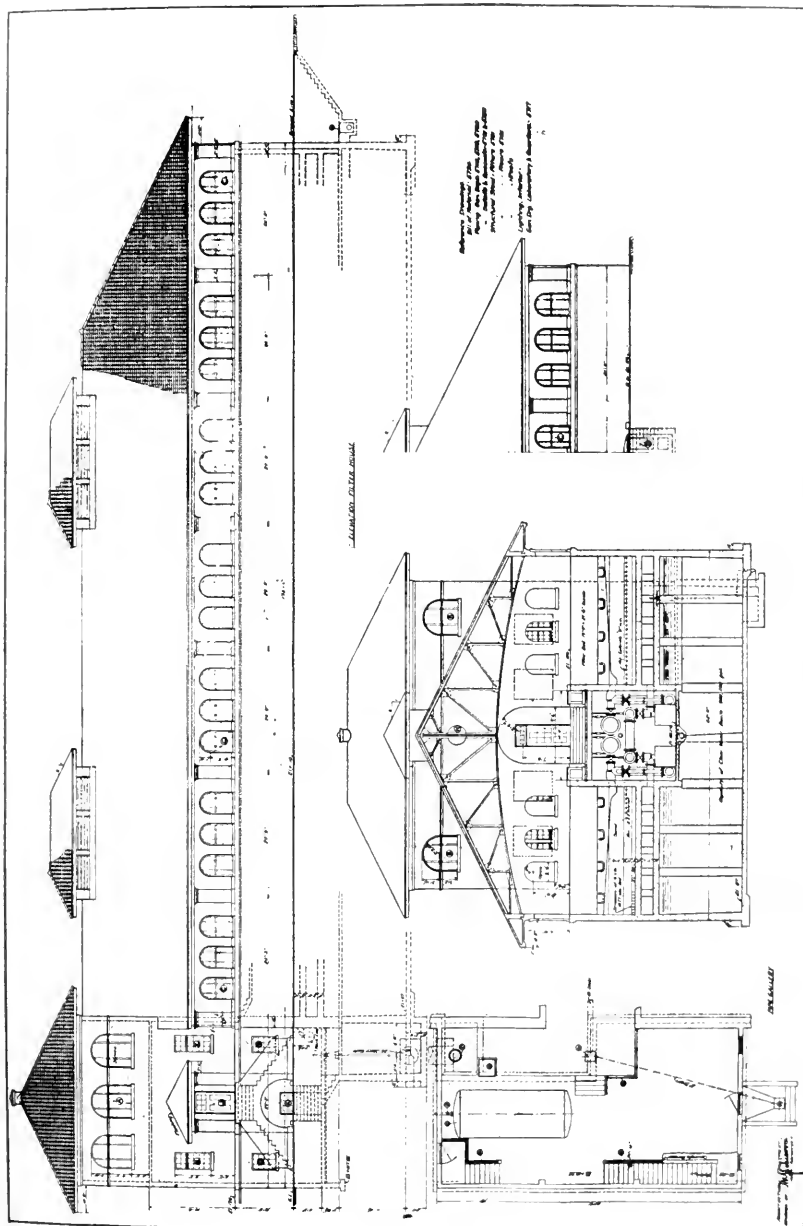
FILTER BUILDING, EAST ELEVATION AND SECTION LOOKING SOUTH.
